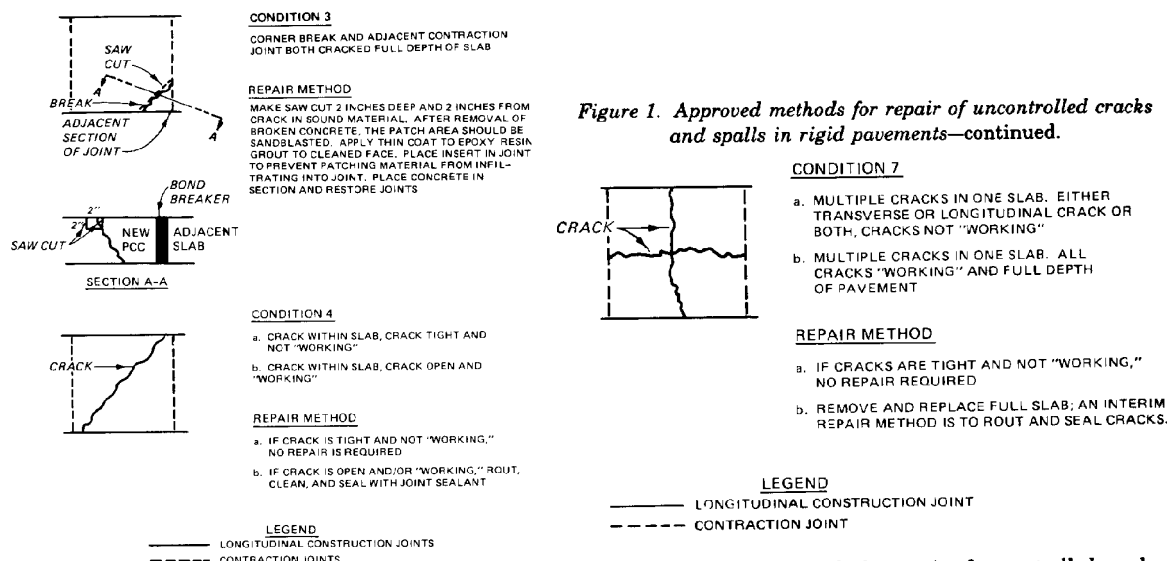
Approved methods for repair of uncontrolled cracks and spalls in rigid pavements—continued.
